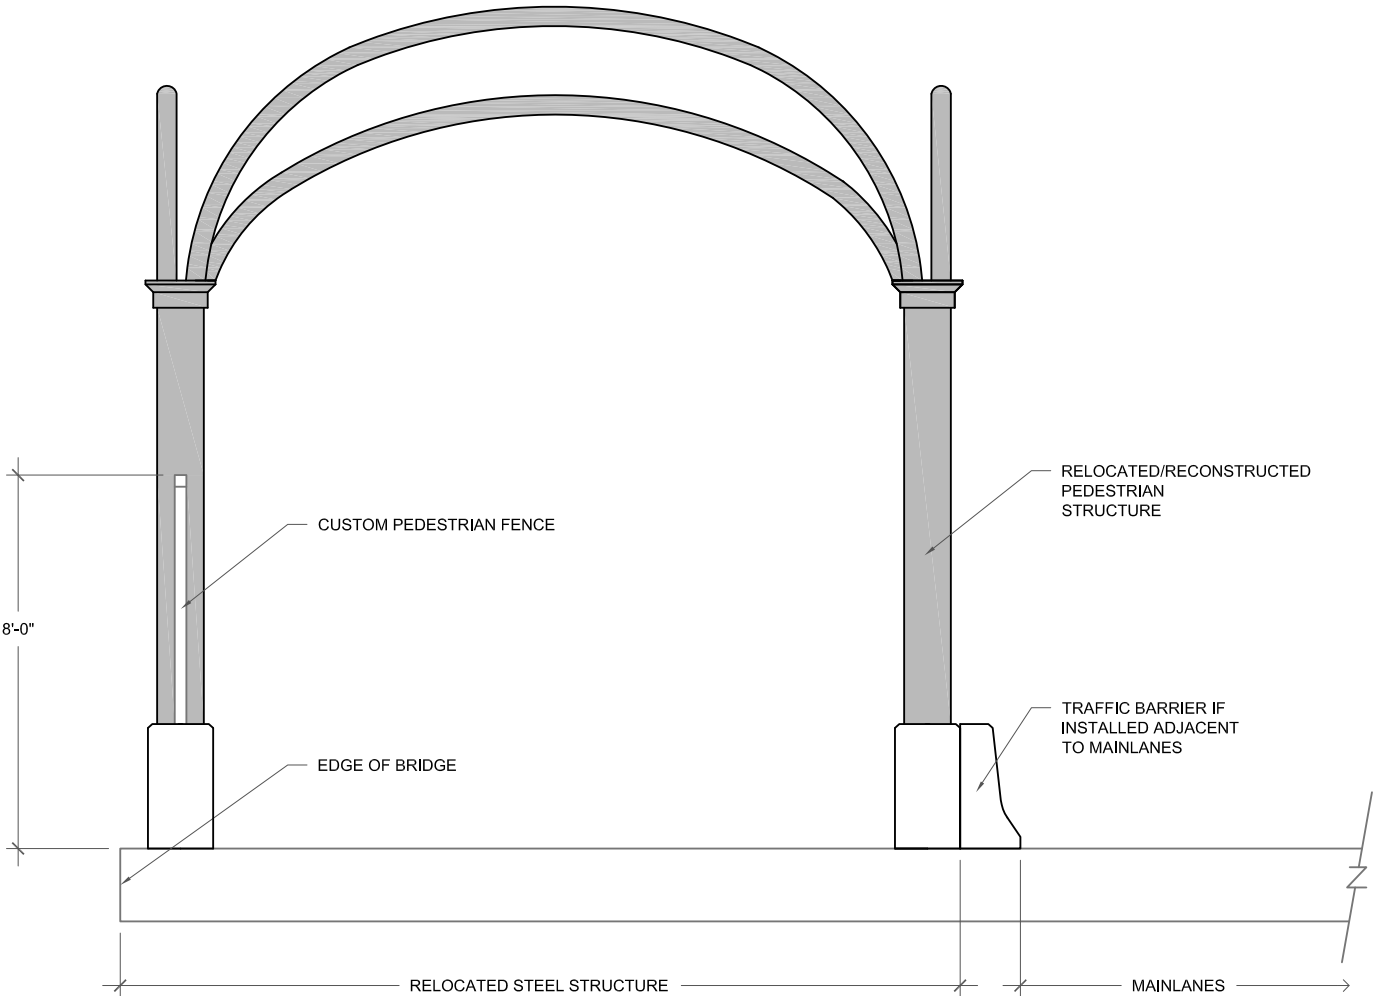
North Staples Street bridge pedestrian crossing with steel pedestrian arch
